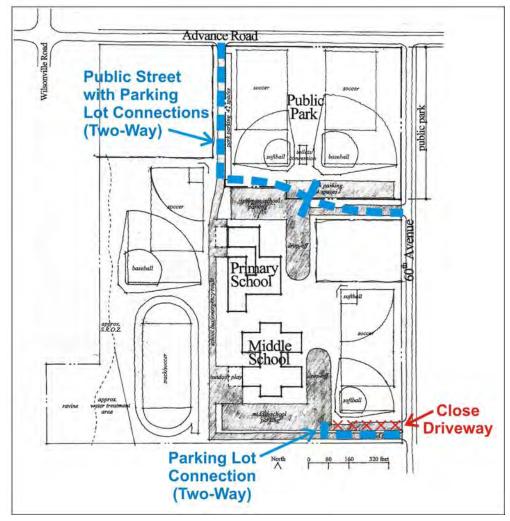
Site Plan Modification Schematic (Site Plan Option #1)
